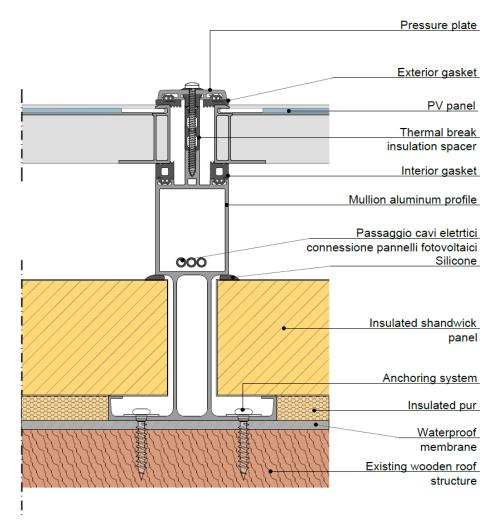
Cross-section of the BIPVT roof system with insulation panel [drawing created using AutoCAD]
